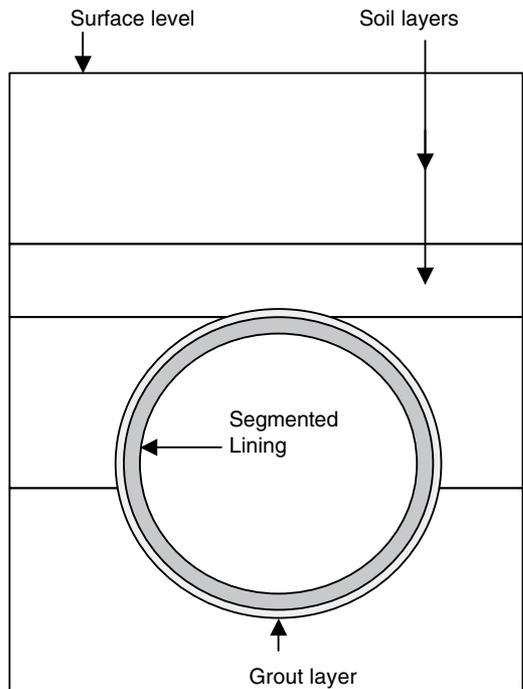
Schematic representation of the tunnel section modelled (Lokhorst et al.).
